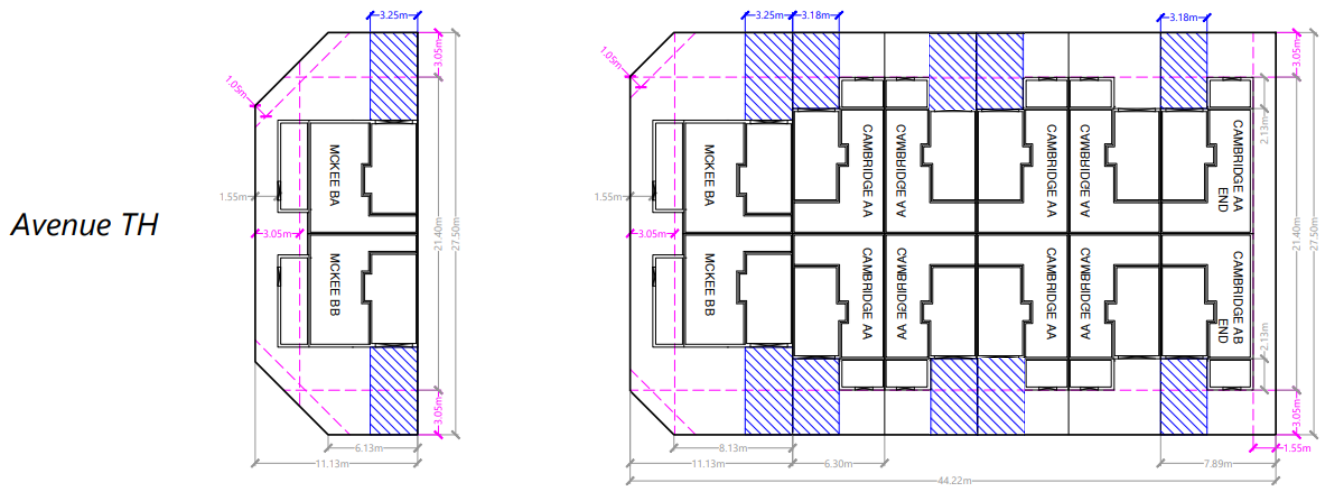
Conceptual Site Plan Layouts for back-to-back townhouse dwellings. House footprints, outlined in black.
